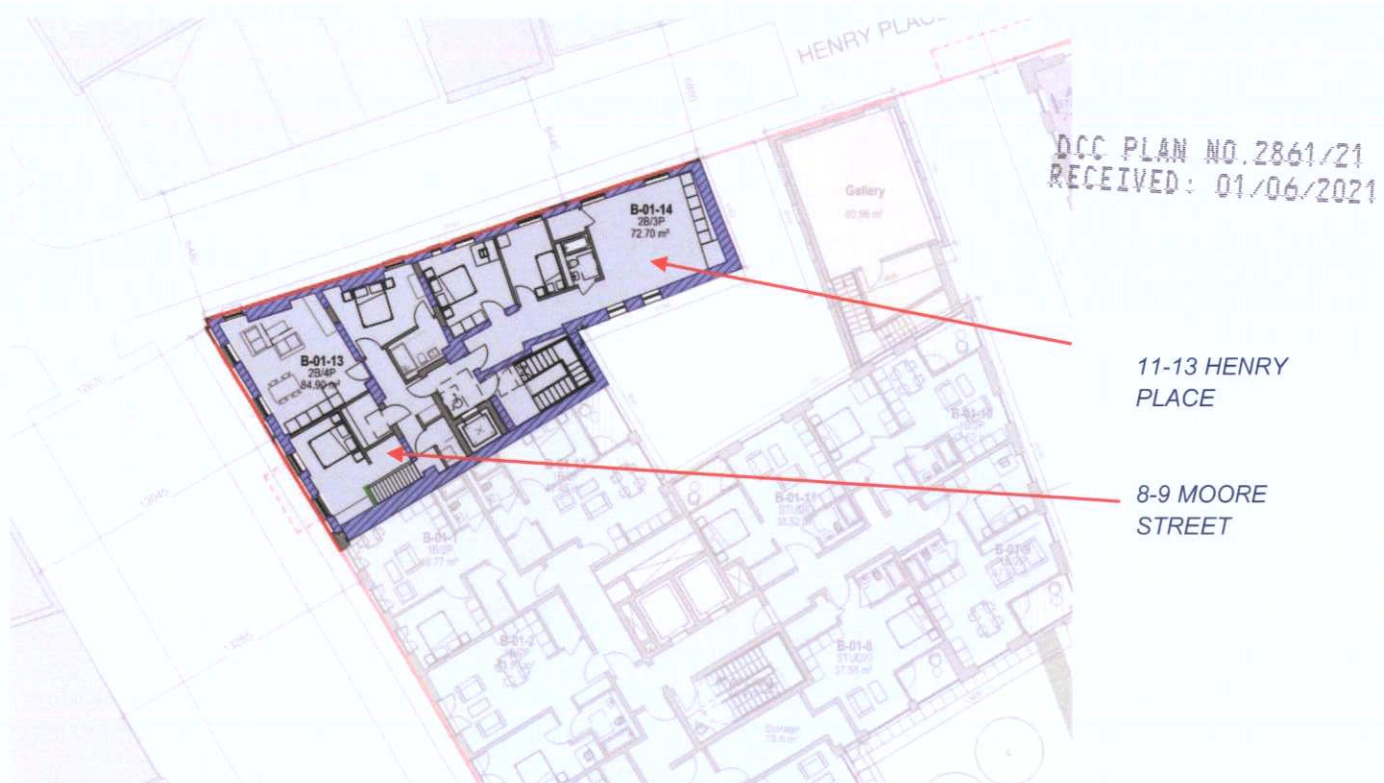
Location of Masonry-Timber Structure at 8-9 Moore Street.
